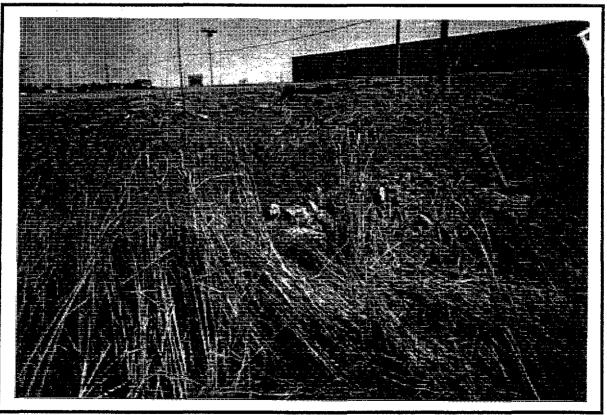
Outlet on the West side of the Fifth Line cross culvert.
